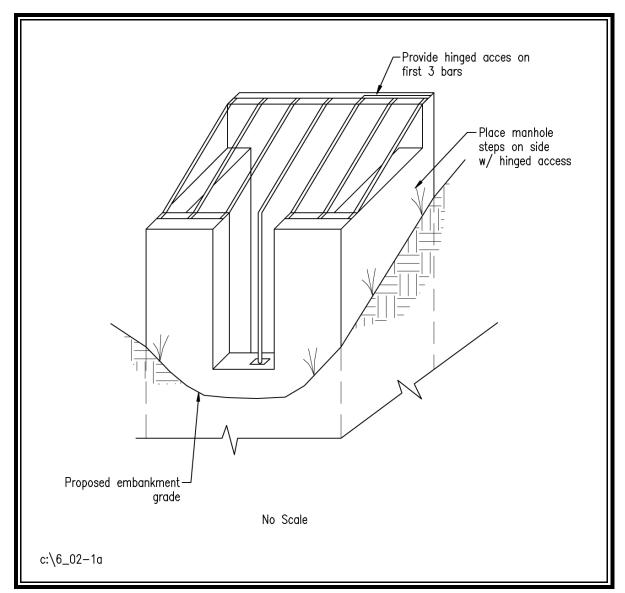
Riser Weir and Trash Rack - Perspective
